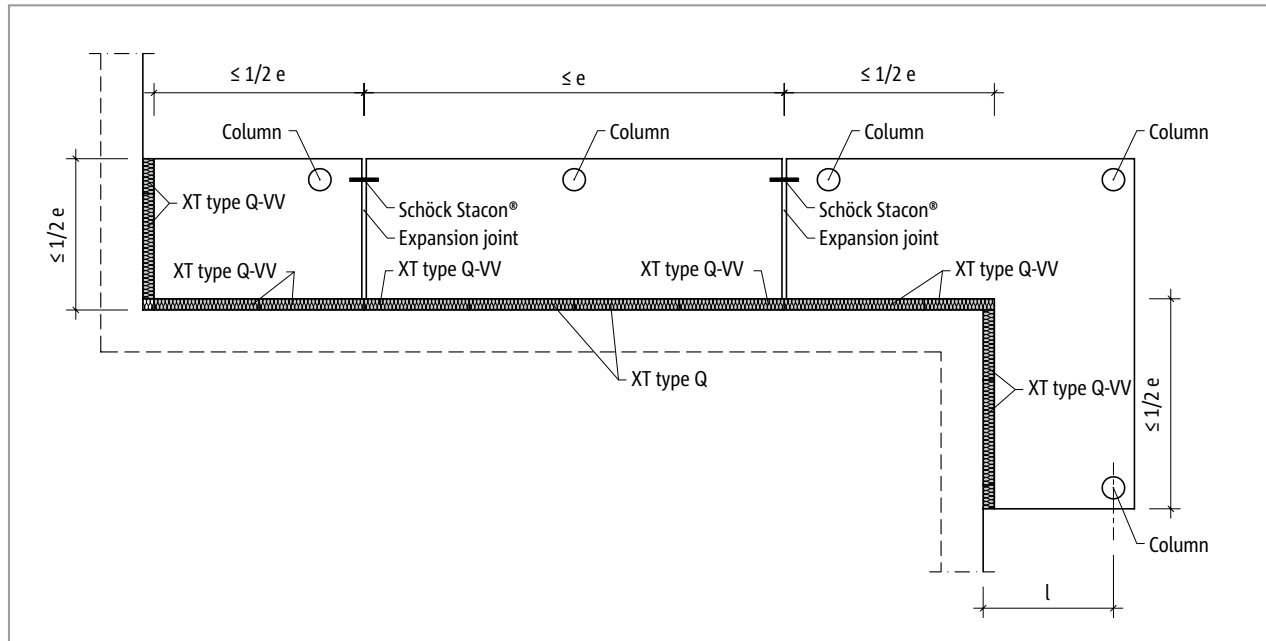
Schöck Isokorb® XT type Q, Q-VV: Expansion joint arrangement
